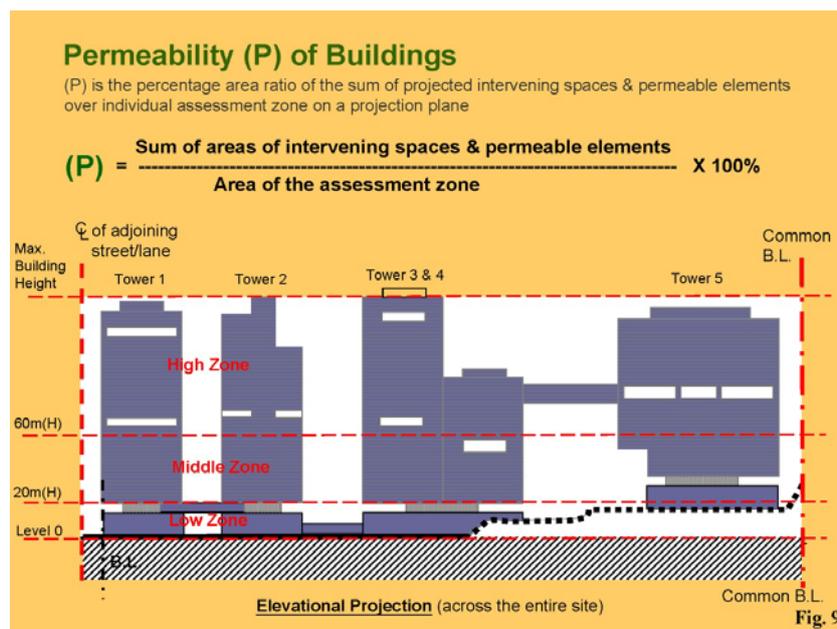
A illustration of permeability of buildings in SBD guidelines in Hong Kong (Hong Kong Buildings Department, 2011).
